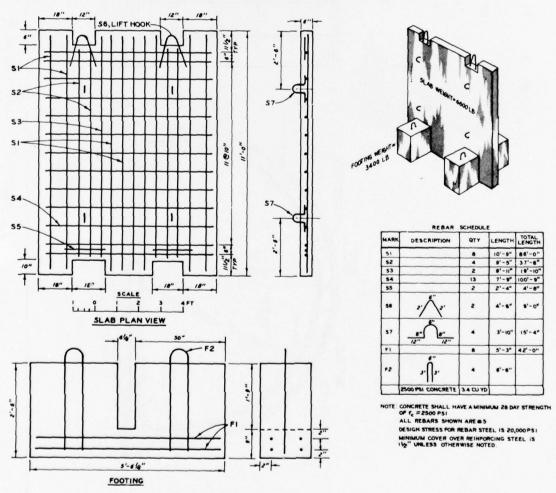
Structural plans for precast concrete panel revetment with footers (from Reference 54)
